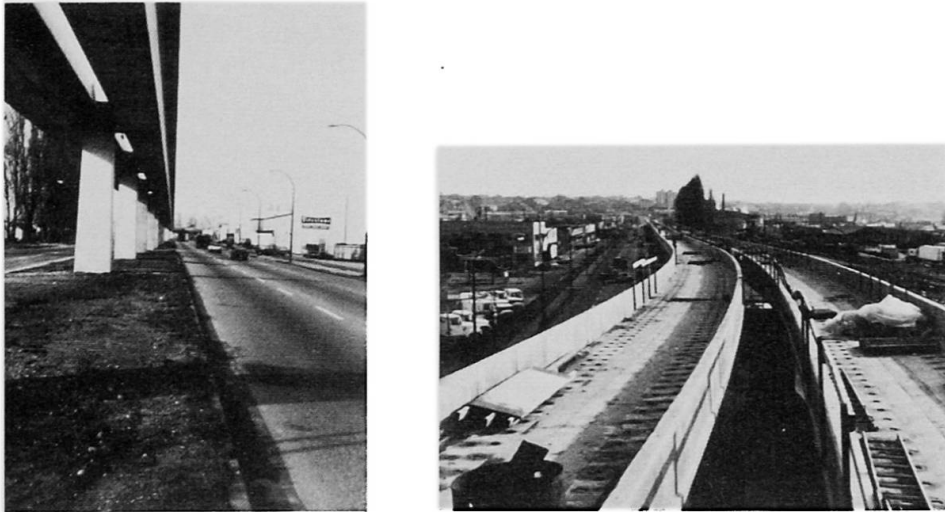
The Vancouver Advanced Light Rapid Transit System uses linear induction motors and continuously welded rails. Left is a photo of the completed structure from below, and right shows the beams during construction. (Photos by ABAM Engineers)
